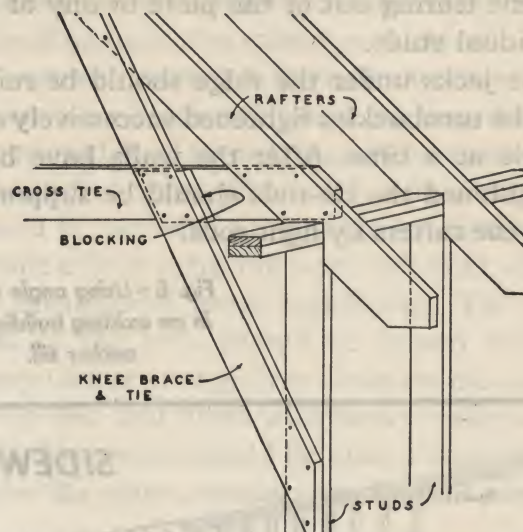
In buildings with cross ties at the plate line, roof and sidewalls should be tied together.
